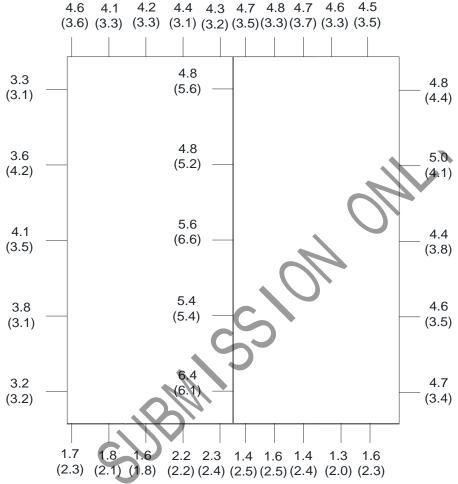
Gaps Measured between Door Leaves and Door Frame as Viewed from the Unexposed Face of Specimen FU236220 All dimensions are in mm.
